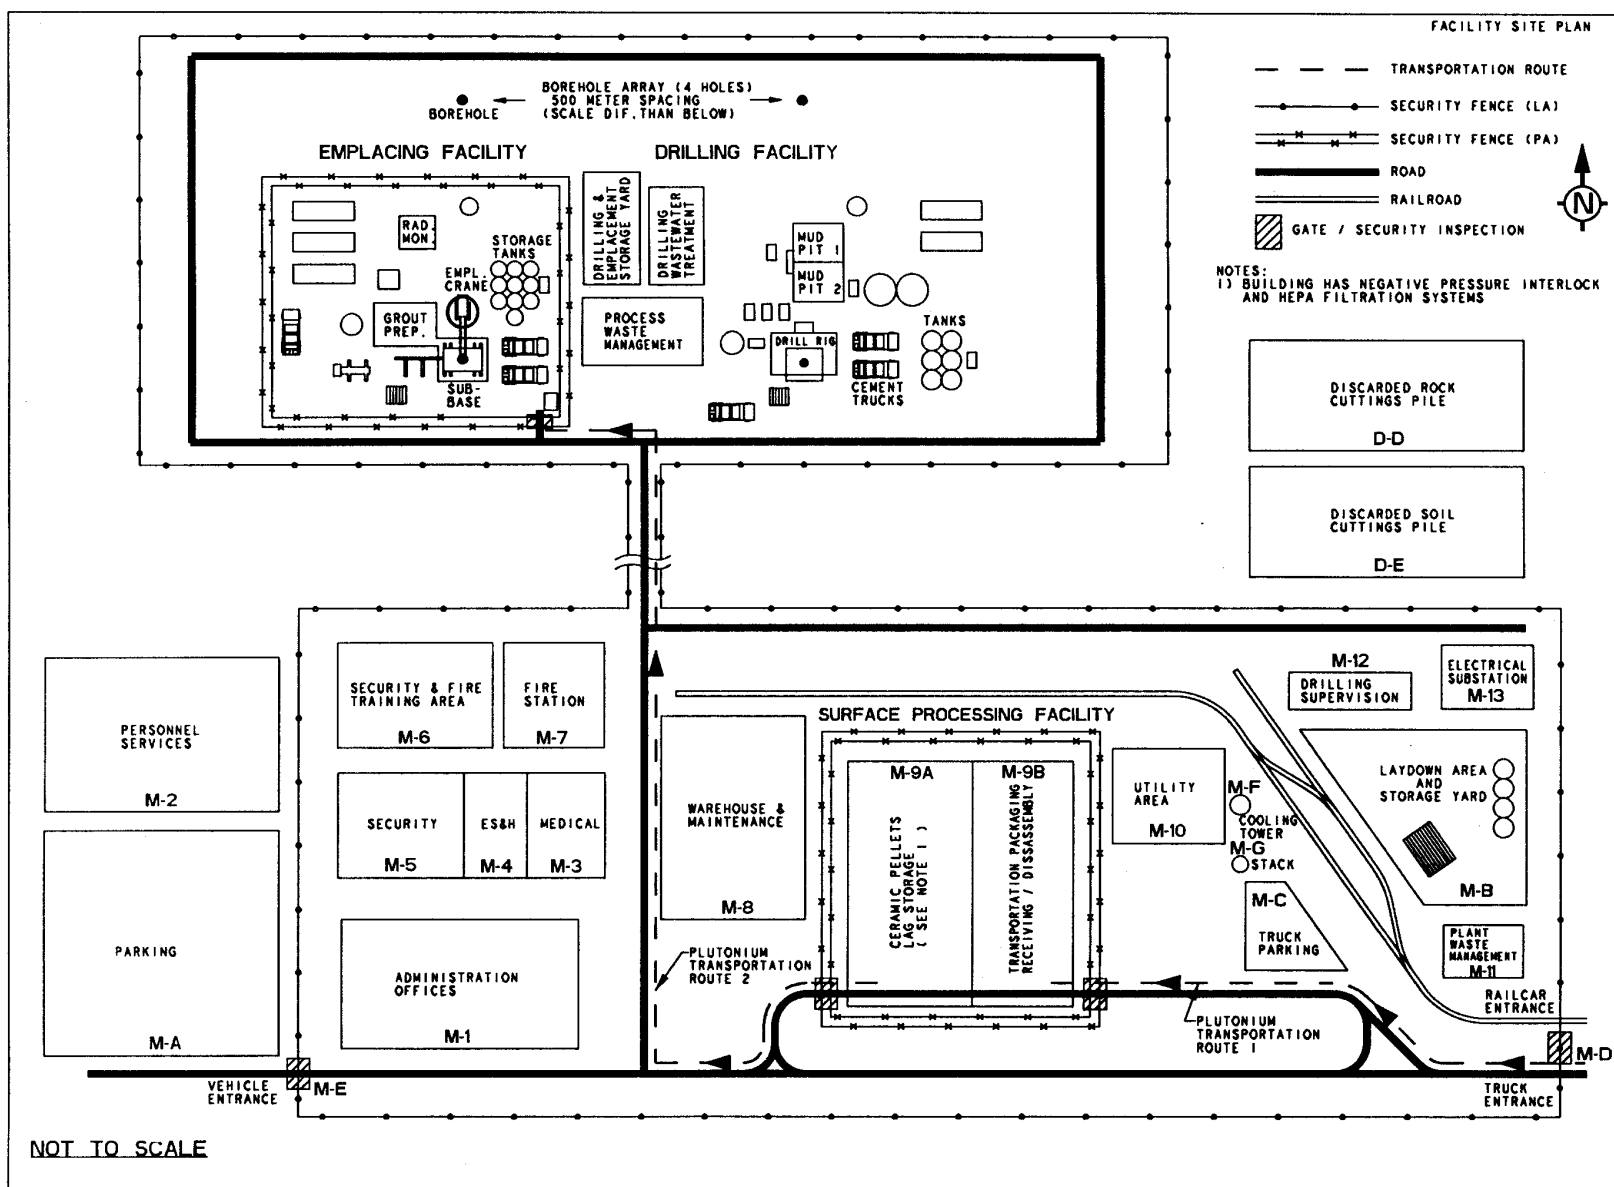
Deep Borehole Disposal Facility Site Plan Detail and Plutonium Transportation Routes.
